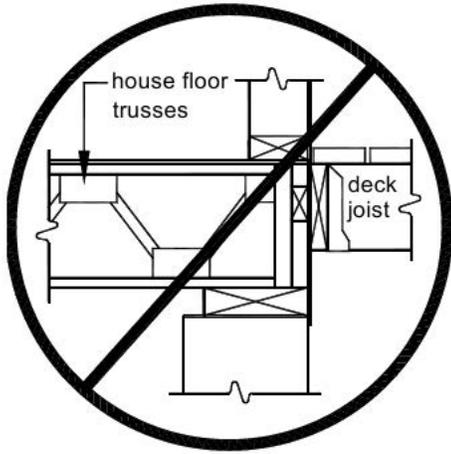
NO ATTACHMENT TO OPEN WEB TRUSSES
